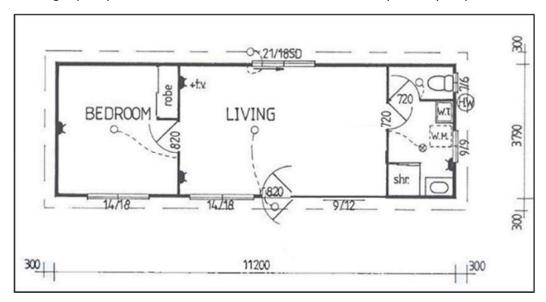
Typical Flor plan of Staff Accommodation demountable
